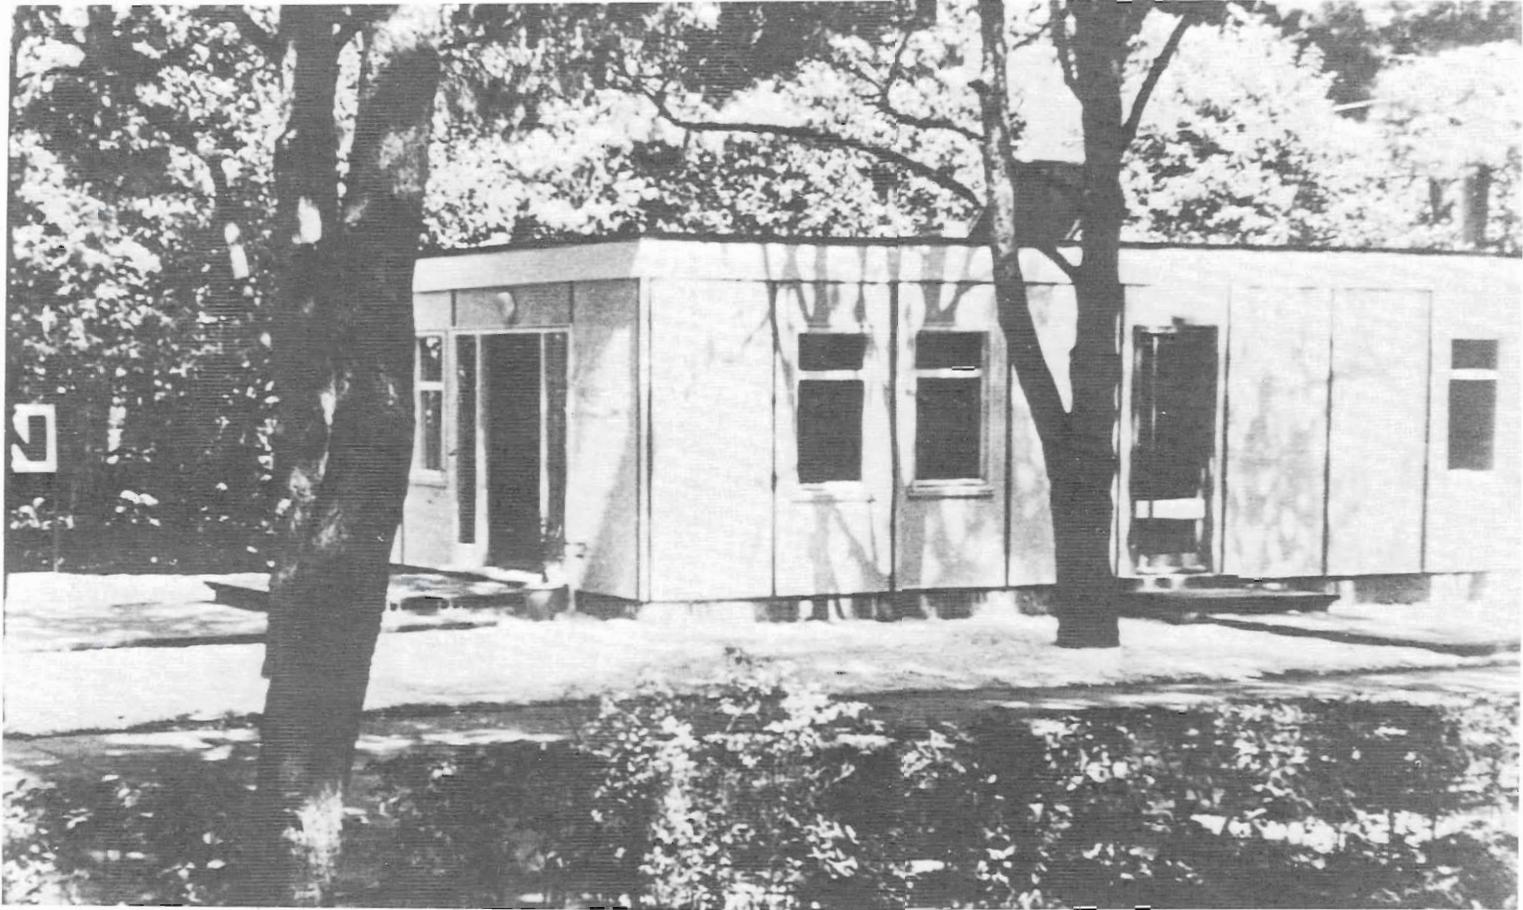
Precast lightweight reinforced concrete panel building, Turkey. Lightweight concrete panel construction is capable of adequately withstanding earthquake loads if properly designed and built. In the case of this building interior shear walls of adequate strength would be required in addition to the end walls, as the strength of the latter is impaired by the presence of large openings. Cast-in-place reinforced concrete beams, ties and columns contribute substantially to improving the aseismic behavior of such buildings.
